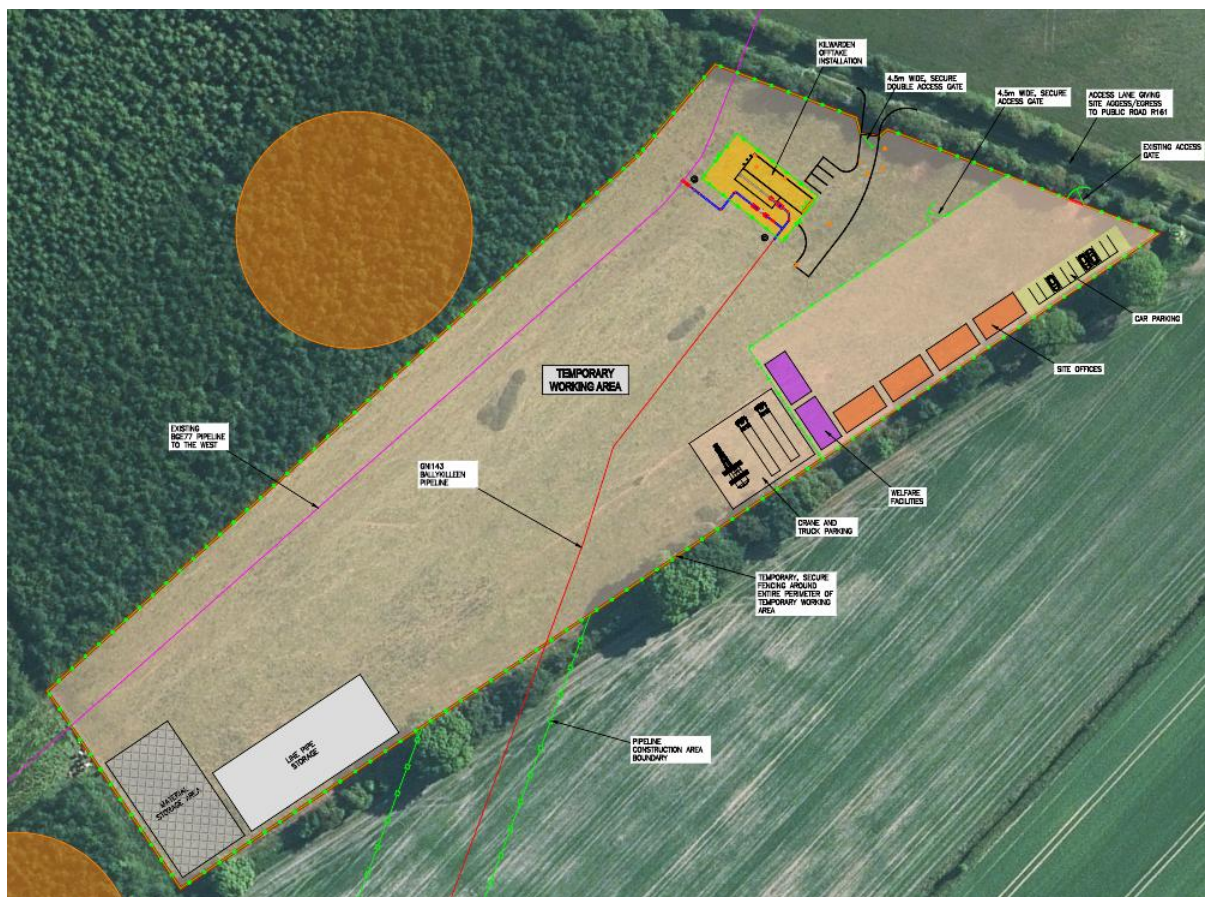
Kilwarden Offtake Installation Construction Compound (refer to drg. no. GNI143-GNI-PL-TCC-0001-01).
